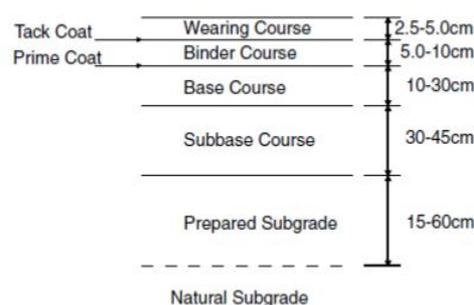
Typical cross section of flexible road pavement (T.F. Fwa,2006)
